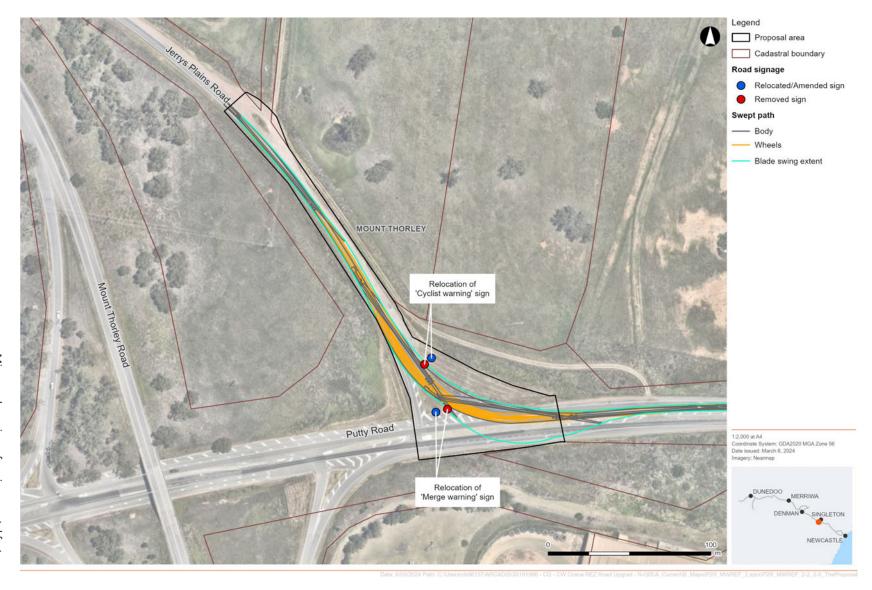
The proposal – Jerrys Plains Road and Putty Road intersection, Mount Thorley (I-007)
